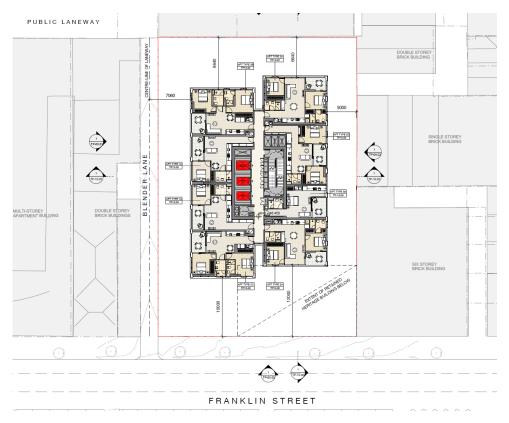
Level 7 floor plan showing typical apartment layout (Source: Applicant)
